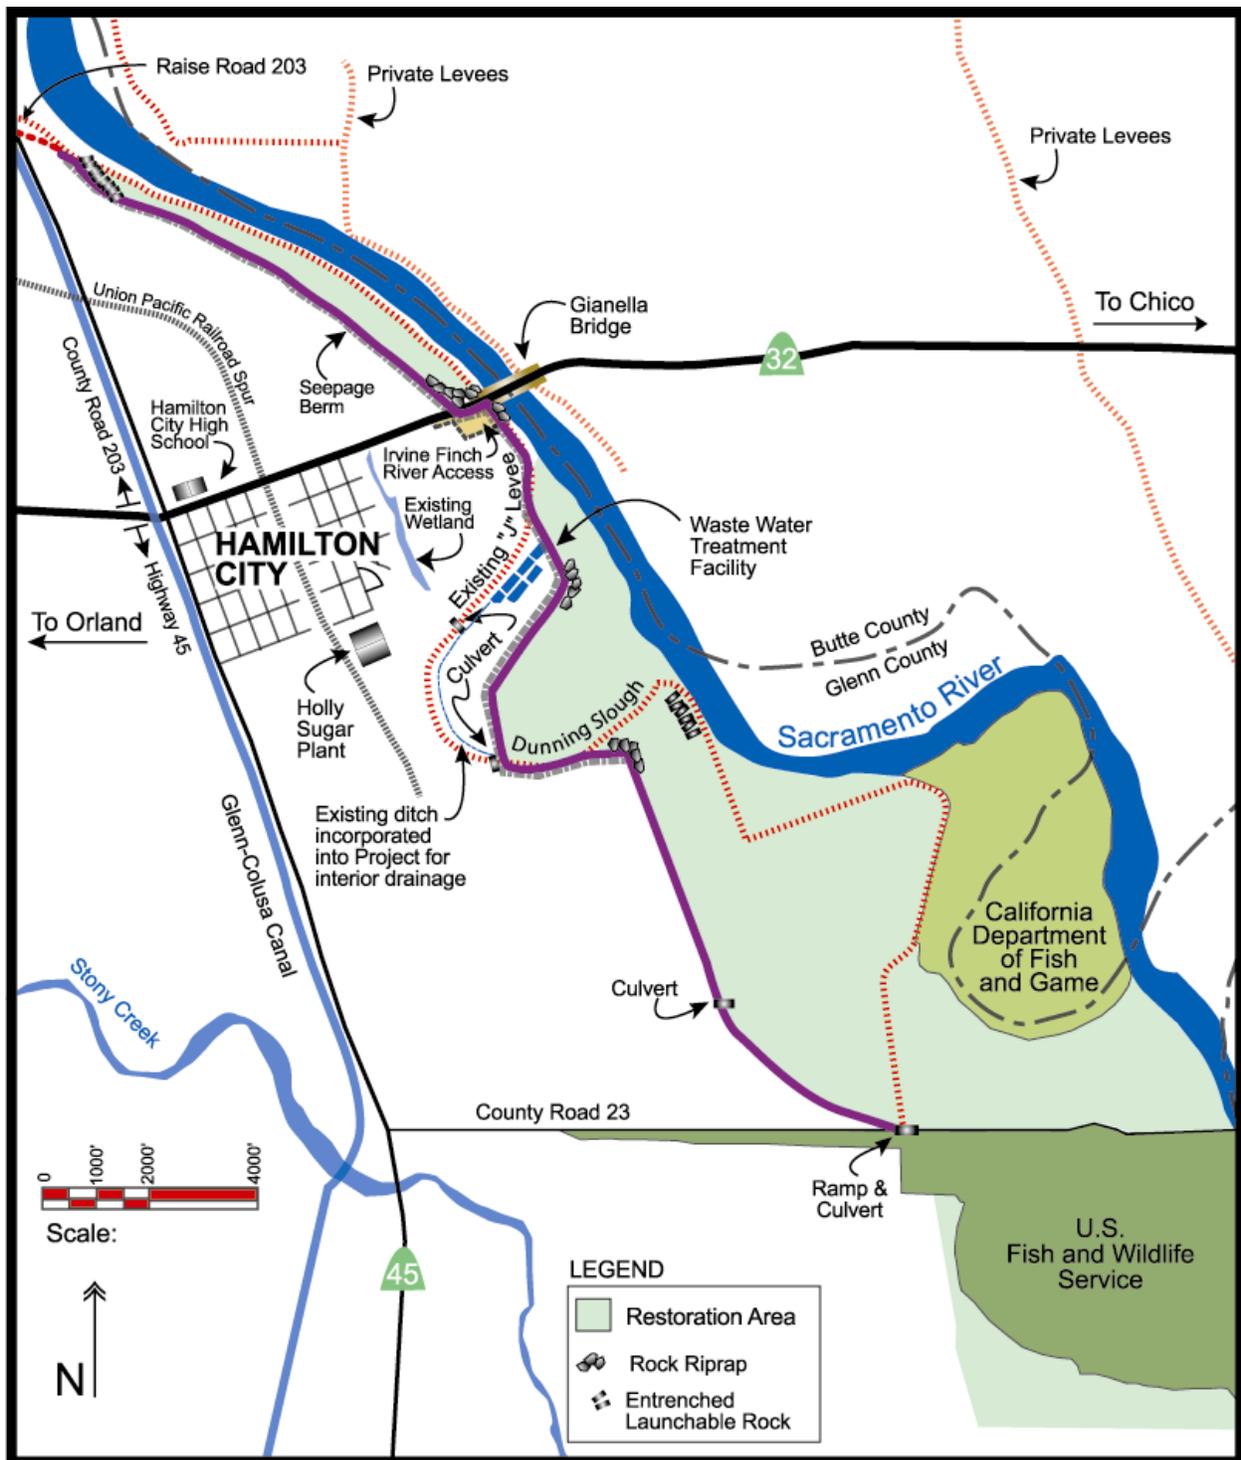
Ecosystem Alternative 1 - Locally Developed Setback Levee
